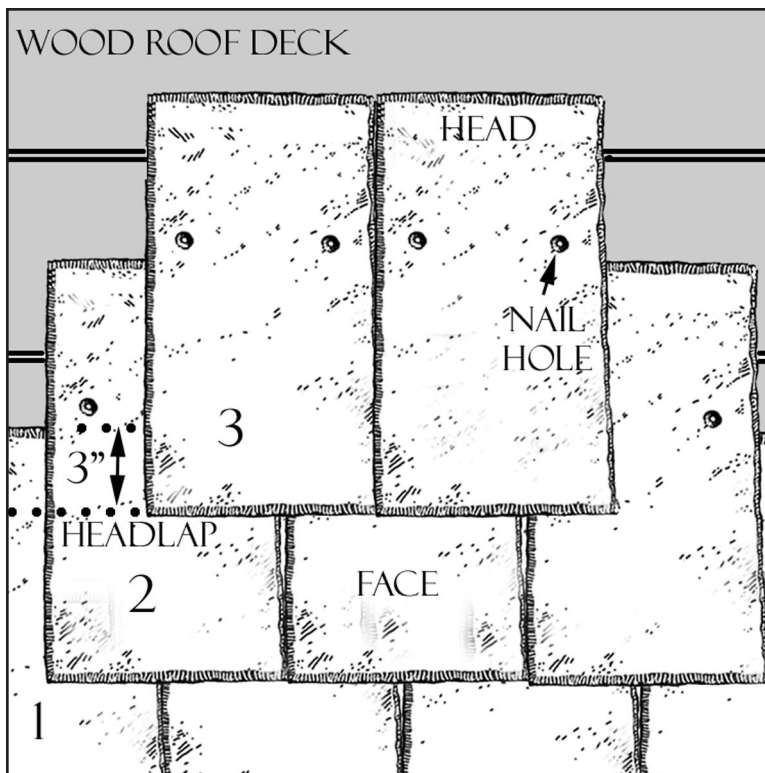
Standard slate installation pattern, showing overlap, headlap, placement of nail holes, “face” and “head” of the slate. Course #3 overlaps course #1 by three inches. This is called the “headlap.”
